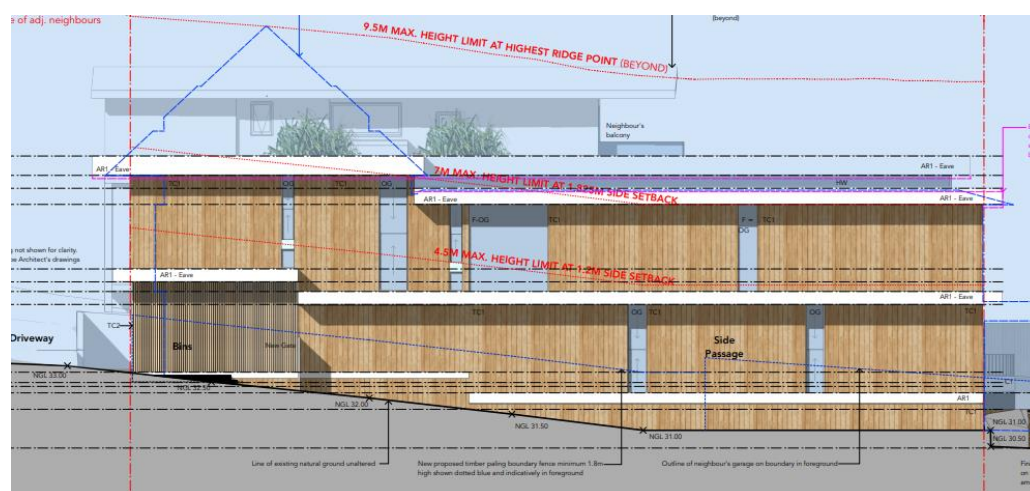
Southern (side) Elevation at 3 - 7 Bona Vista Avenue.
